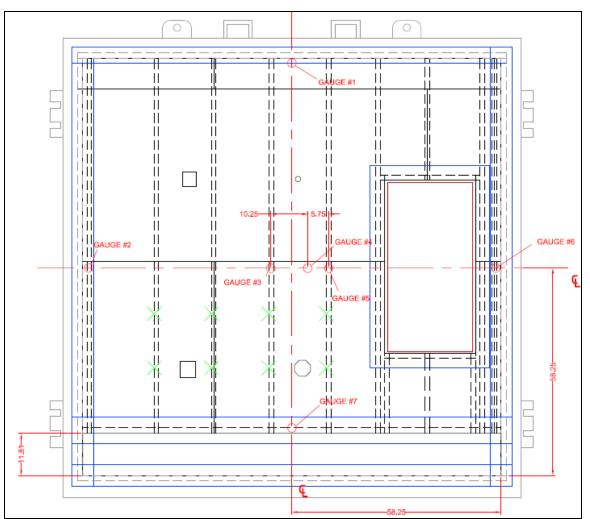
Exova Specimen 12-06-M0324-B Gauge and Penetration Locations
